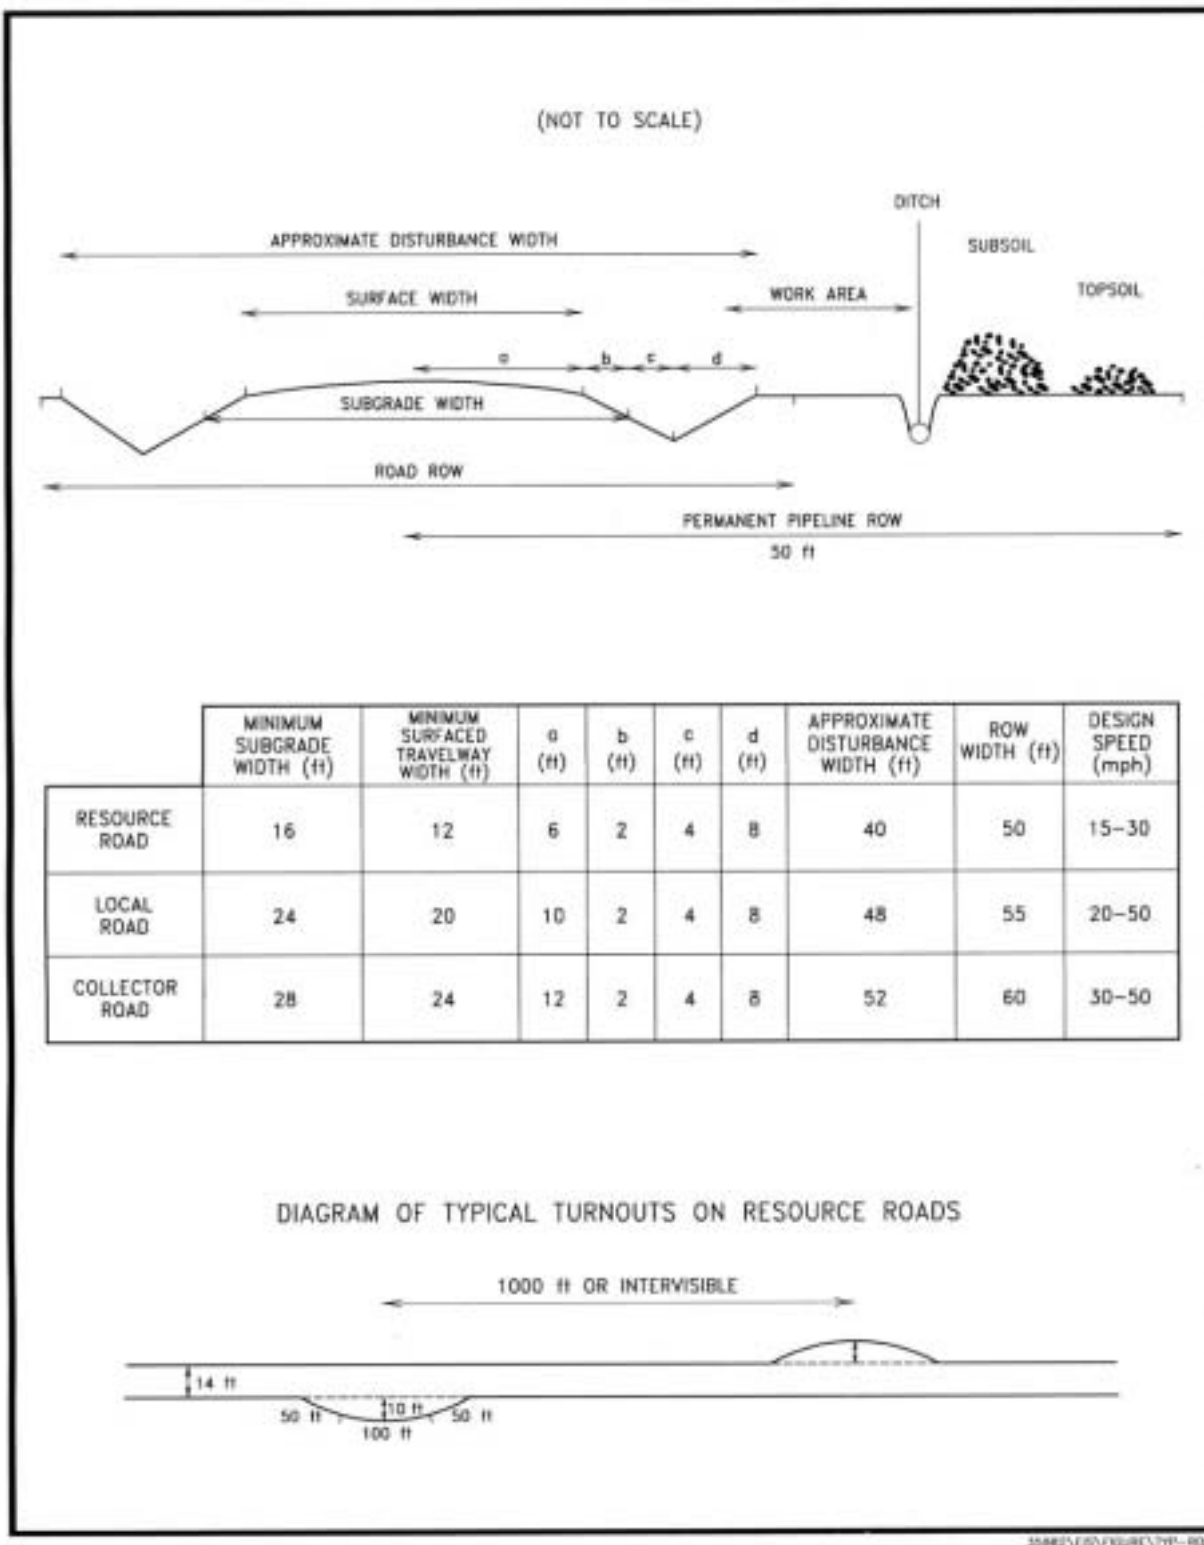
Typical Access Road with Adjacent Pipeline Schematic, Jonah Infill Drilling Program, Sublette County, Wyoming, 2004.
